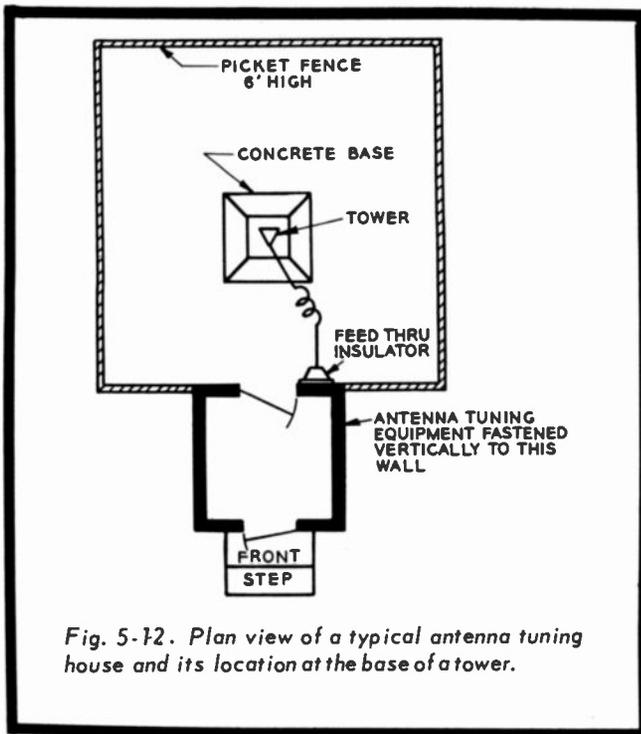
Plan view of a typical antenna tuning house and its location at the base of a tower.
